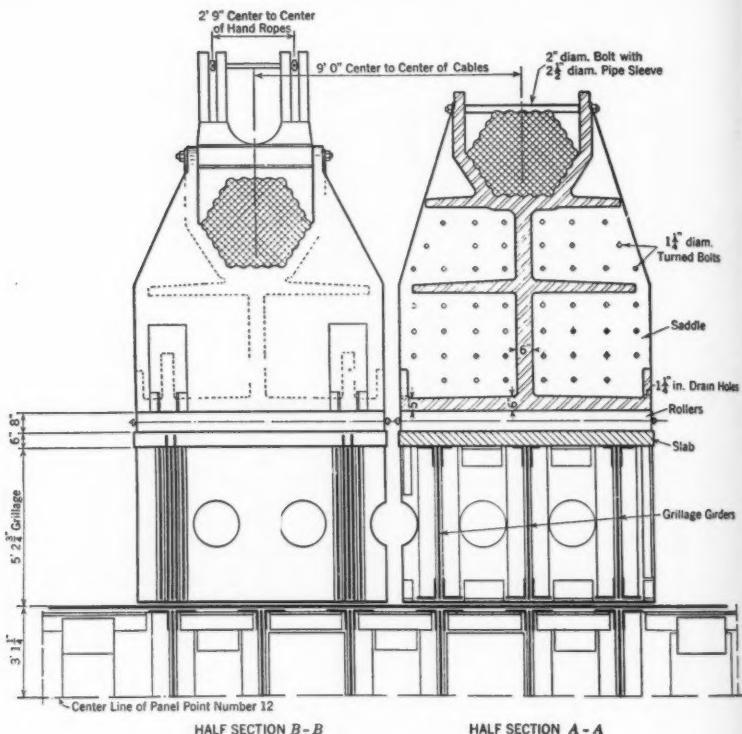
TYPICAL SECTIONS, TOP OF TOWER (SEE, ALSO, FIGS. 14 AND 15).
